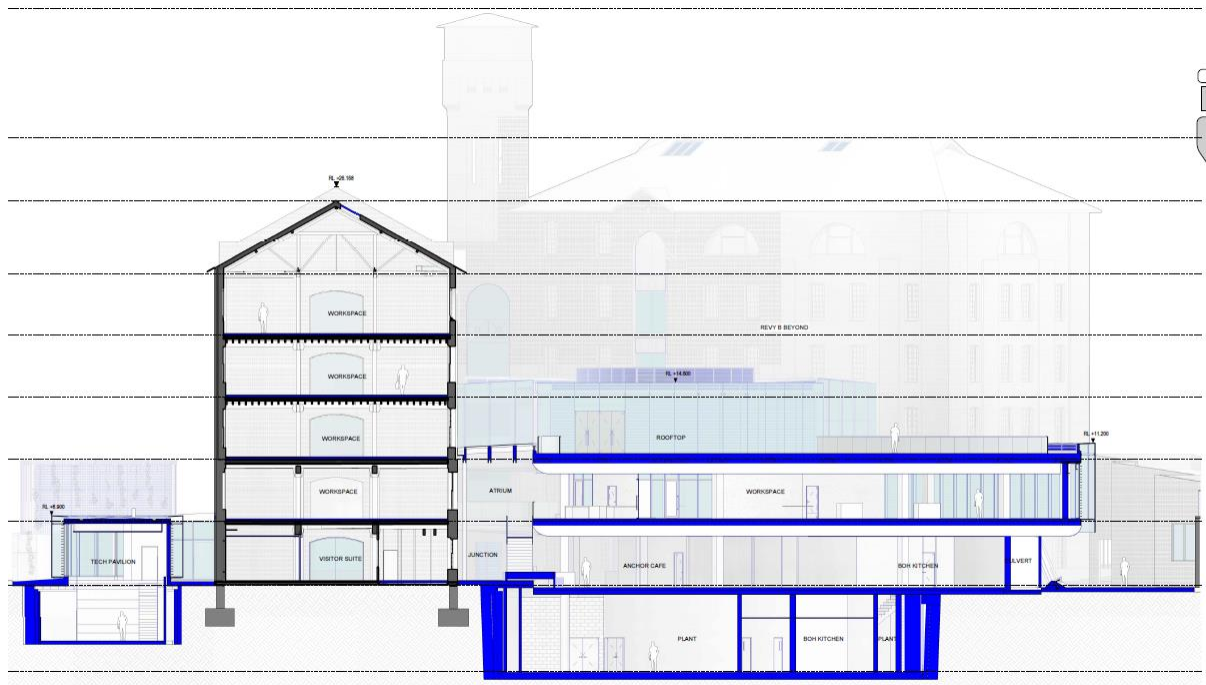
Section plan through REVY A and Building F (new works shown in blue)
